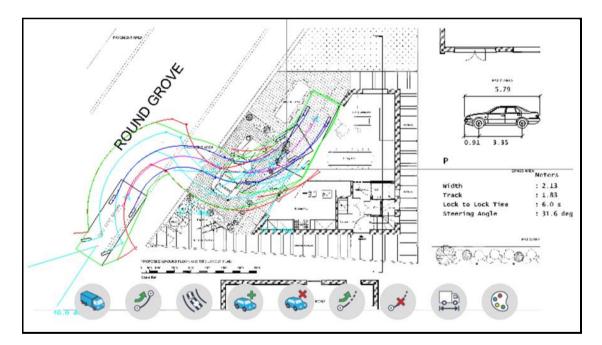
Parallel Parking reversing – attempting to reverse into the Parking Bay
